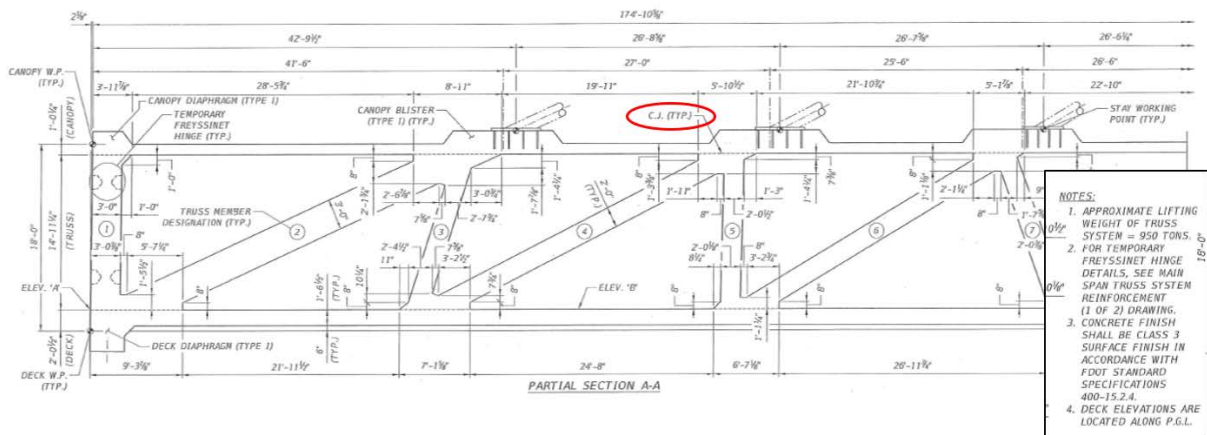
Main Span Truss elevation with construction joints and notes from RFC Sheet B-37.⁶⁸
